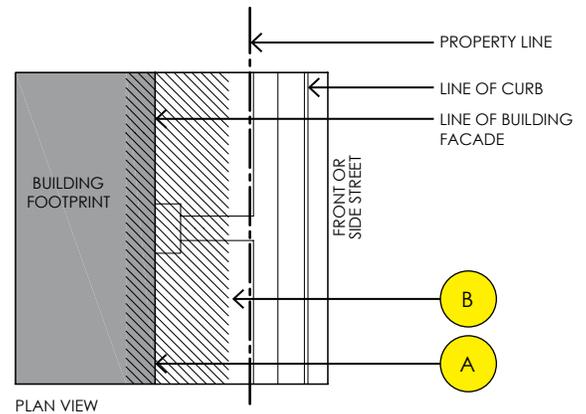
ROWHOUSE BUILDING WITH STOOP
